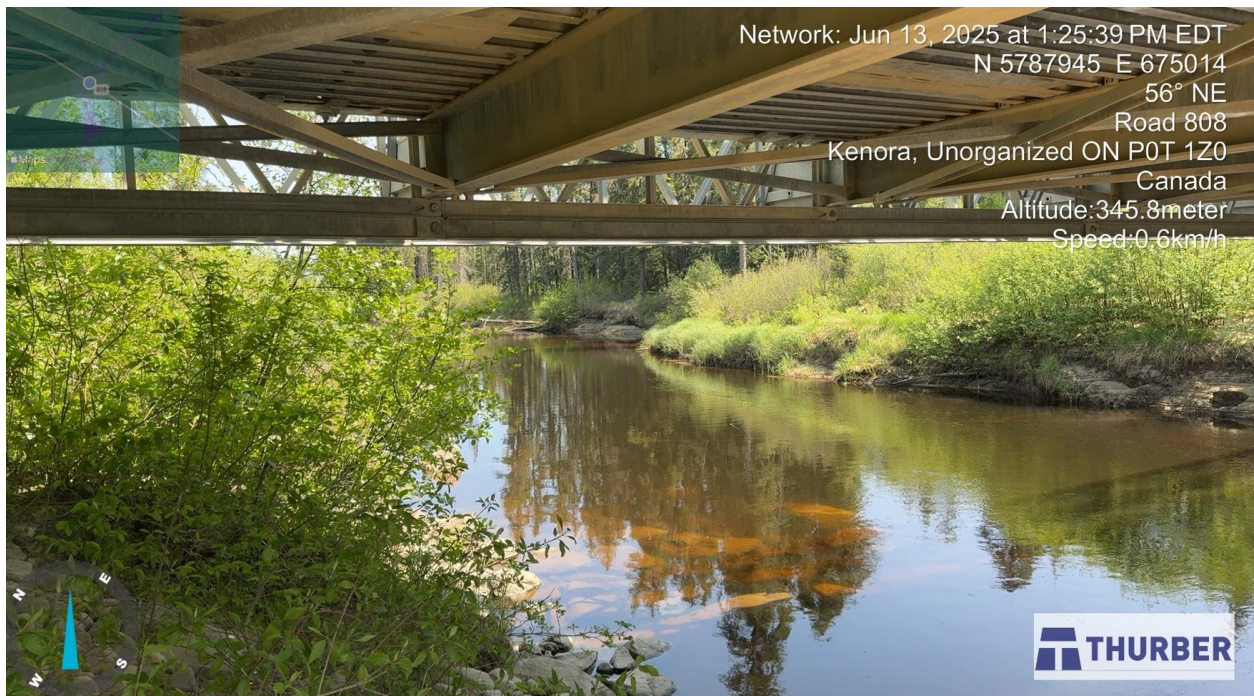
Looking northeast at the river, below the bridge (June 13, 2025)
